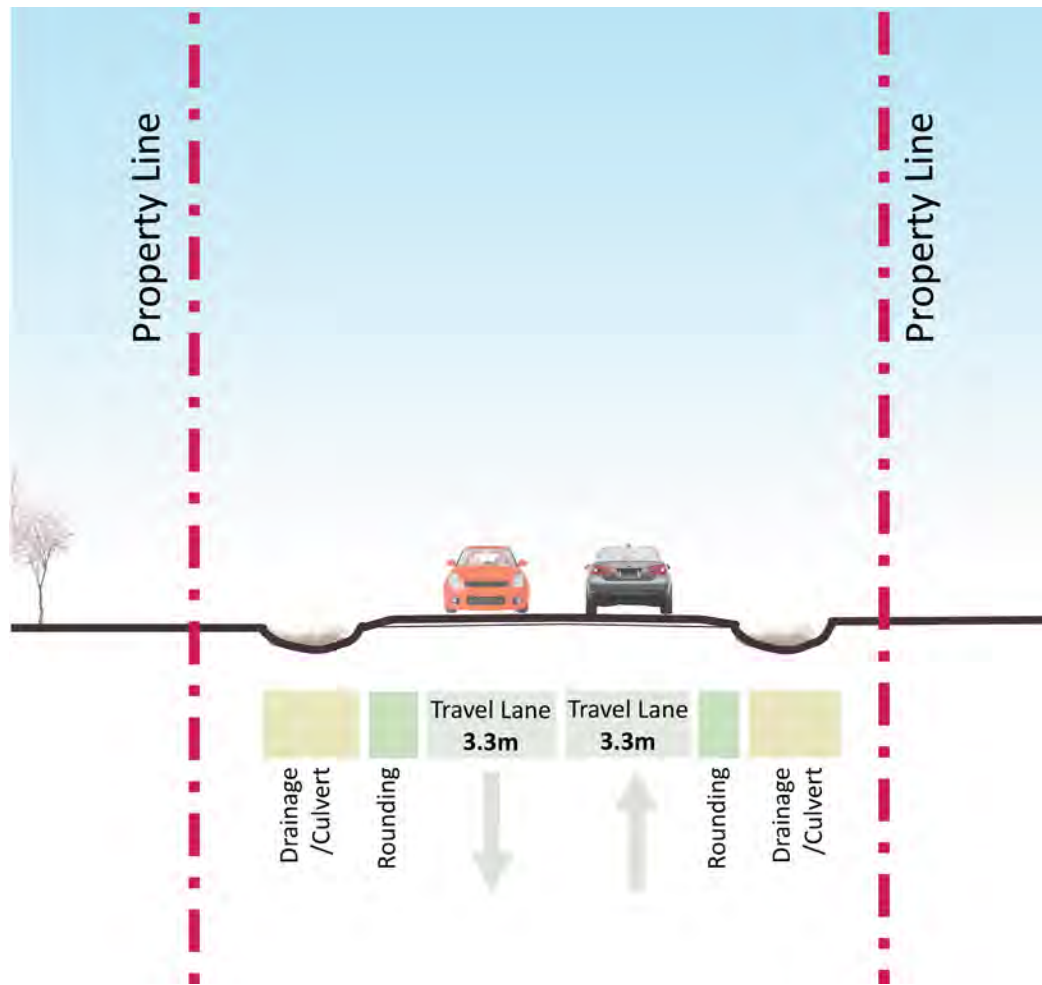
Existing Livingston Avenue Road Cross Section from Casablanca Boulevard to West of Emily Street
